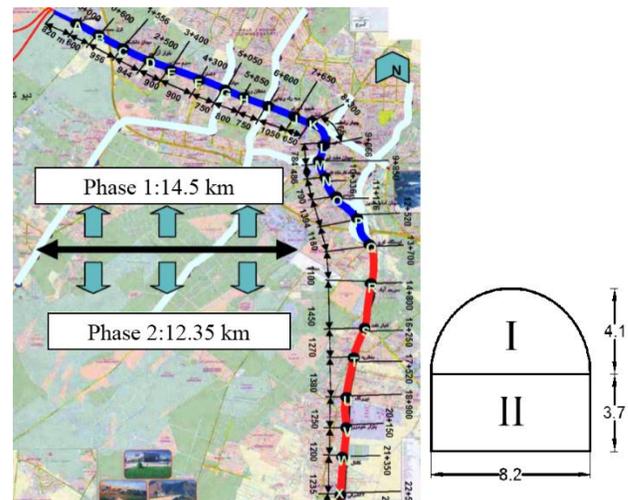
The plan and cross section of Karaj Subway Line 2 [34].
